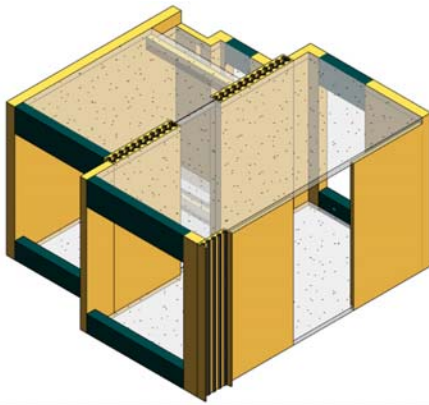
Typical MiC unit structural model for the quantities of framing, walls, slab and formwork
